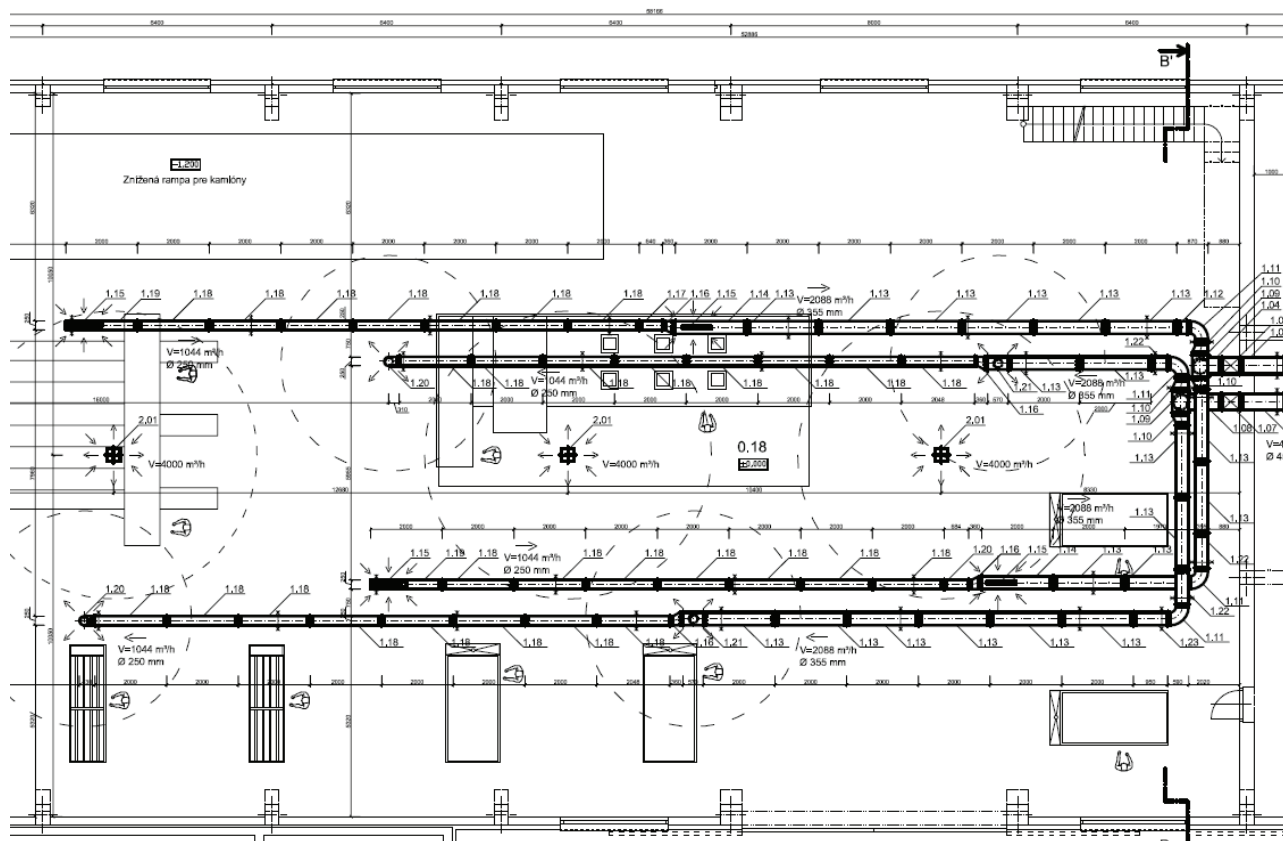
Central ventilation equipment – Plan of industrial building with woodworking operation [13]
